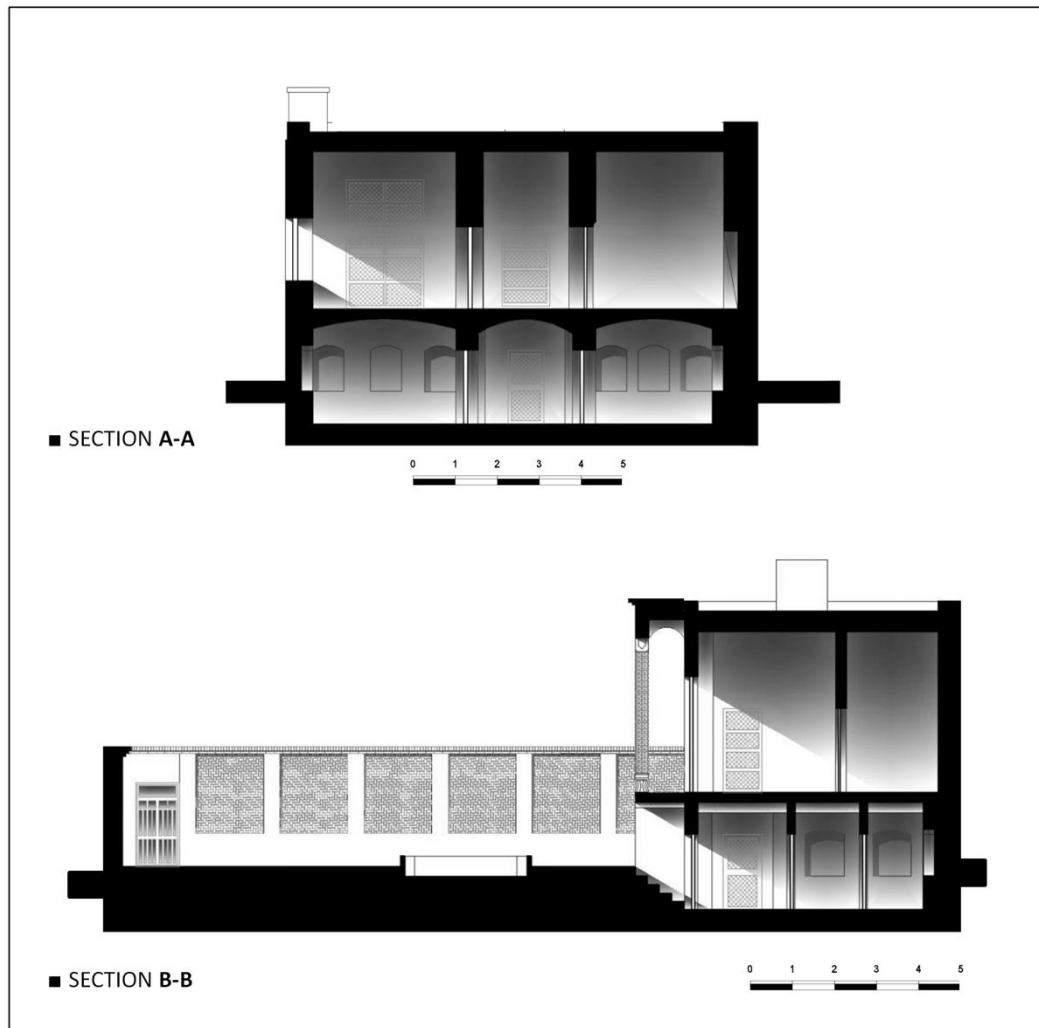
sections of the Afchangi house (Estaji, 2010, Kermani-Moqaddam, 2002a)
